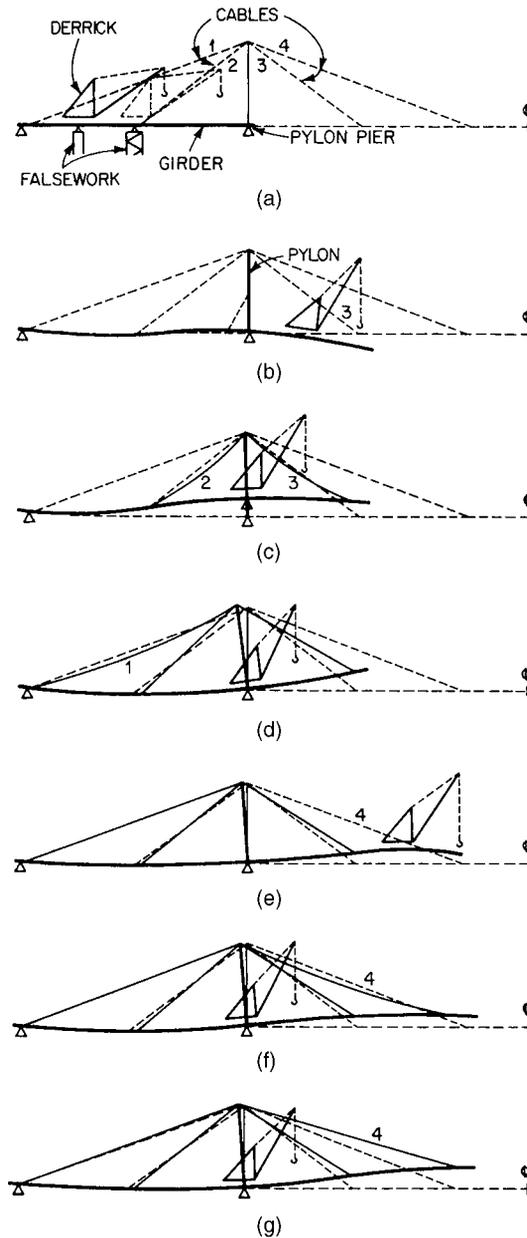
Erection procedure used for the Strömsund Bridge. (a) Girder, supported on falsework, is extended to the pylon pier. (b) Girder is cantilevered to the connection of cable 3. (c) Derrick is retracted to the pier and the girder is raised, to permit attachment of cables 2 and 3 to the girder. (d) Girder is reseated on the pier and cable 1 is attached. (e) Girder is cantilevered to the connection of cable 4. (f) Derrick is retracted to the pier and cable 4 is connected. (g) Preliminary stress is applied to cable 4.
